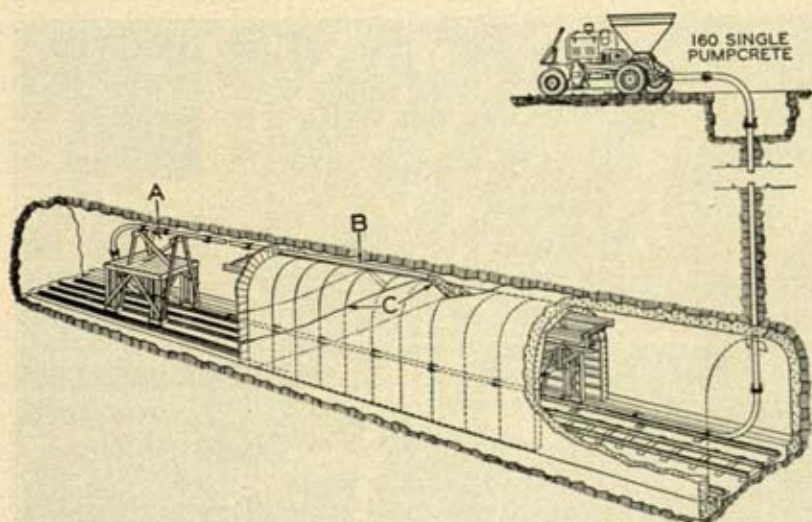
Placing concrete lining in a tunnel with a Pumpcrete machine and a drop pipe. (Chain Belt Co.)
